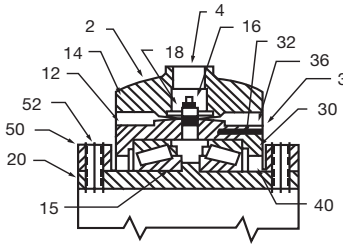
Replacement Parts for (Type K and DOUBLE-INTERLOCK) Bearings
